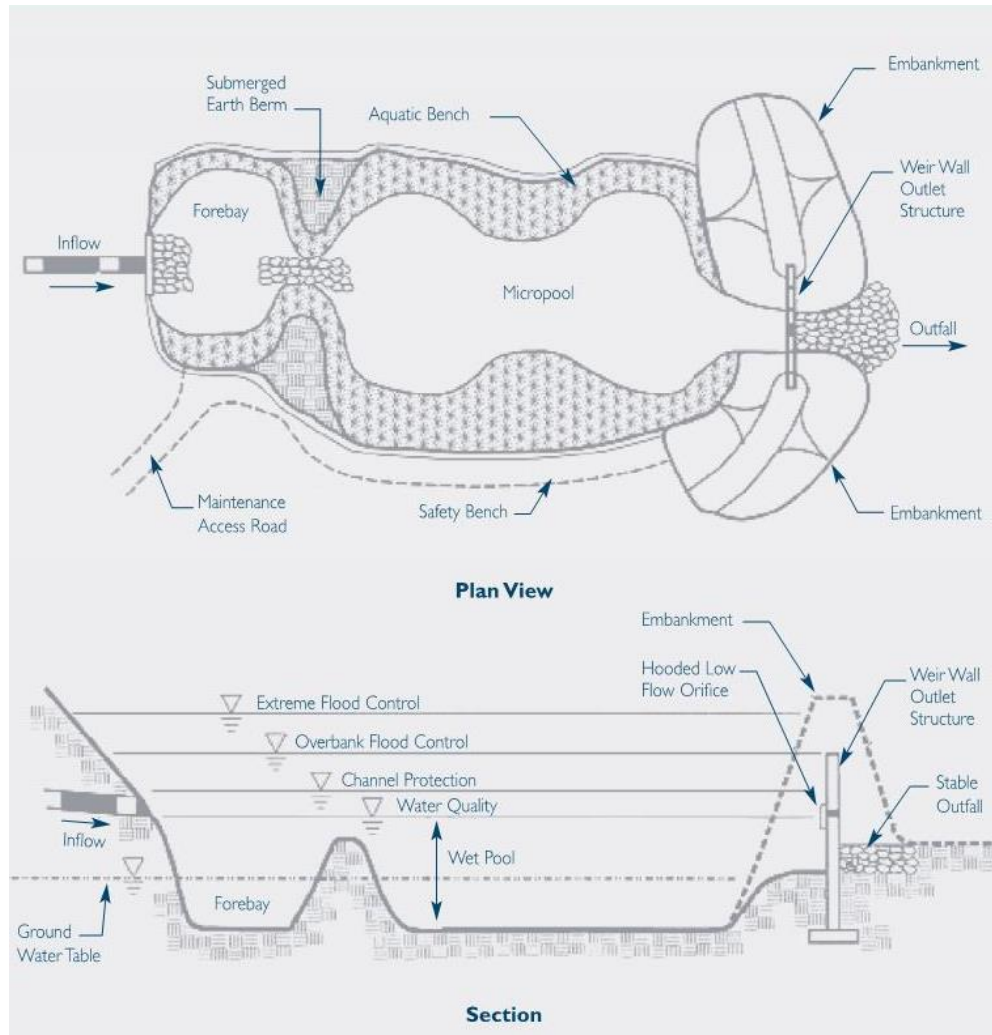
Plan & Cross Section of Pocket Pond (CT DEEP, 2004)
